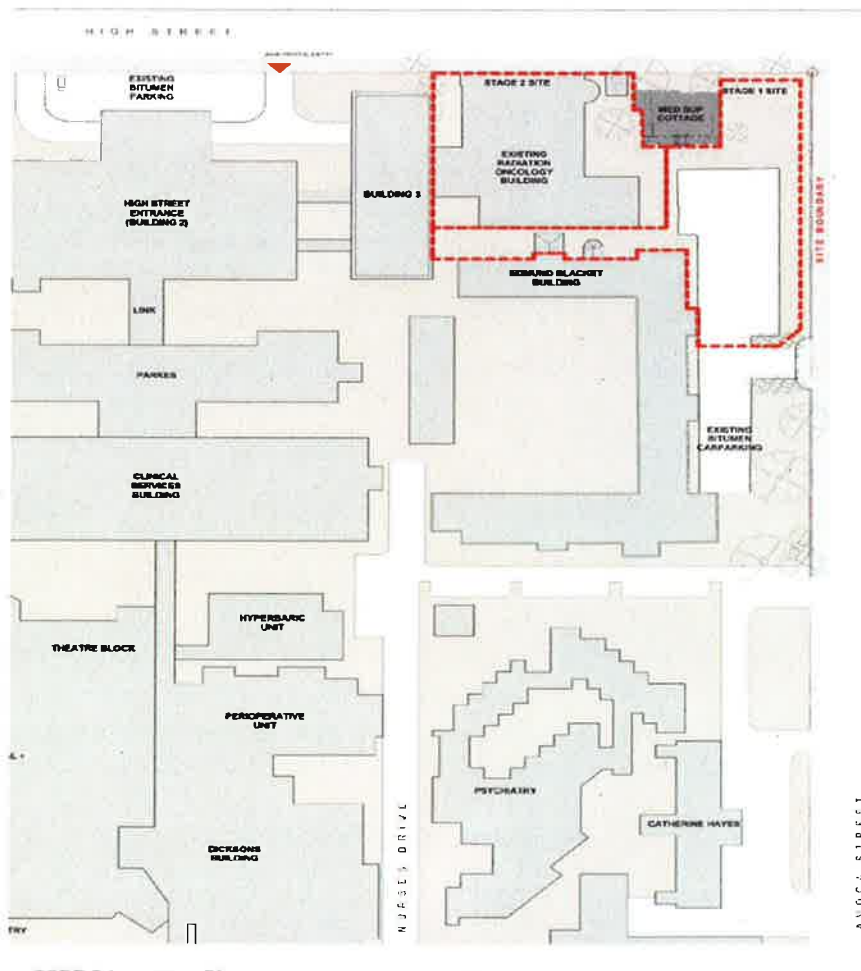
Location Plan (Source: applicant's EIS, March 2012)
